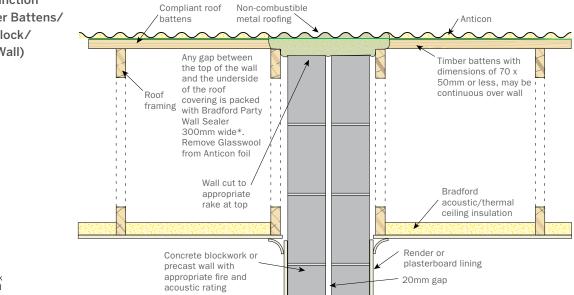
Party Wall/Roof Junction (Metal Roof/Timber Battens/ Double Concrete Block/ Precast Concrete Wall)
